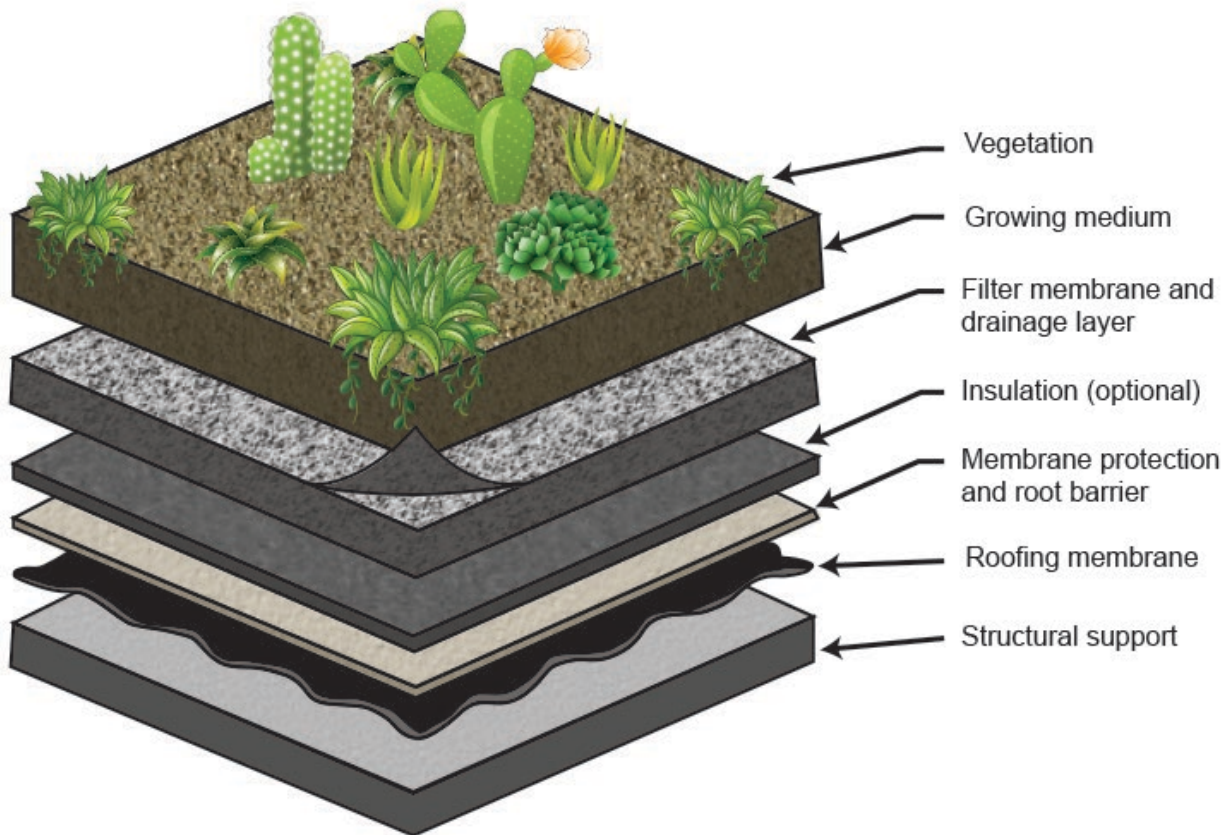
Typical green roof cross section (Colorado UDFCD 2010).
